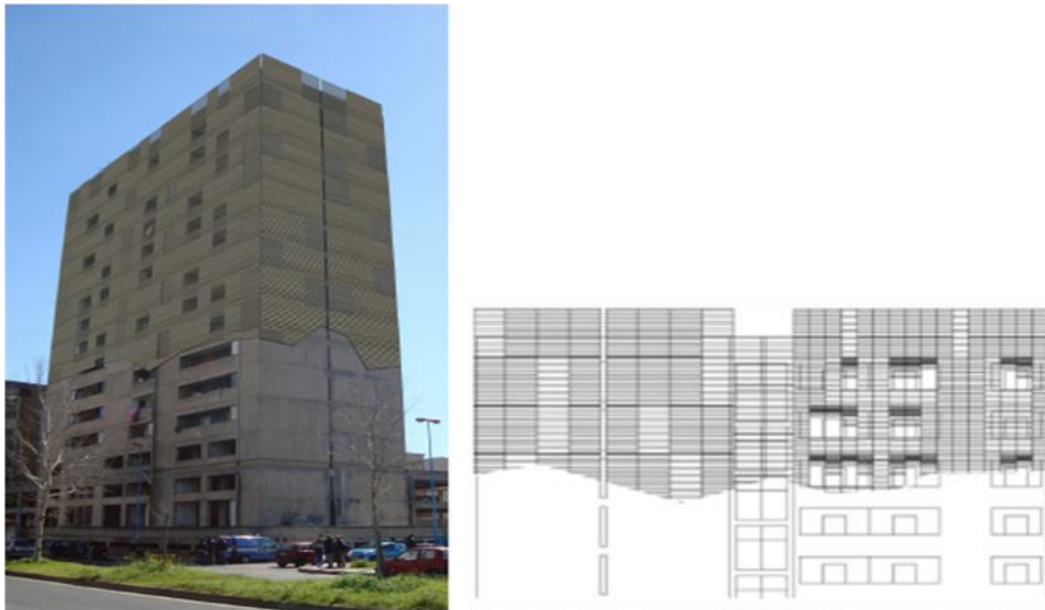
Proposed Building – Current façade and simulation of the new proposed solar thermal cover.
